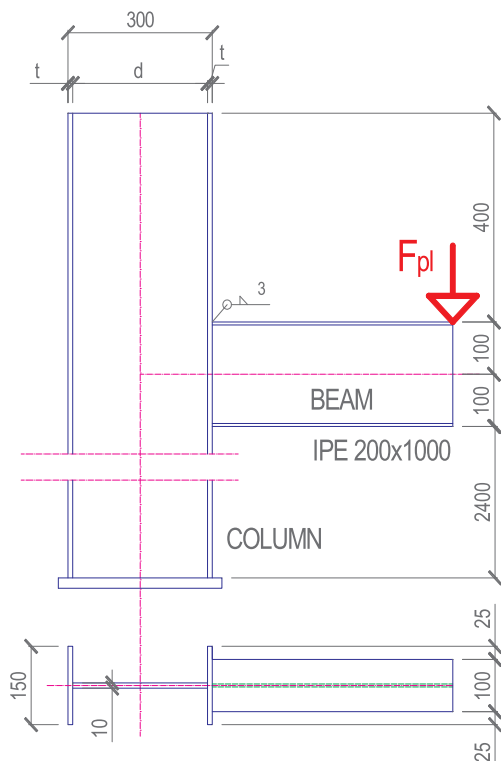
Technical details of the analysed structure (dimensions in mm).
